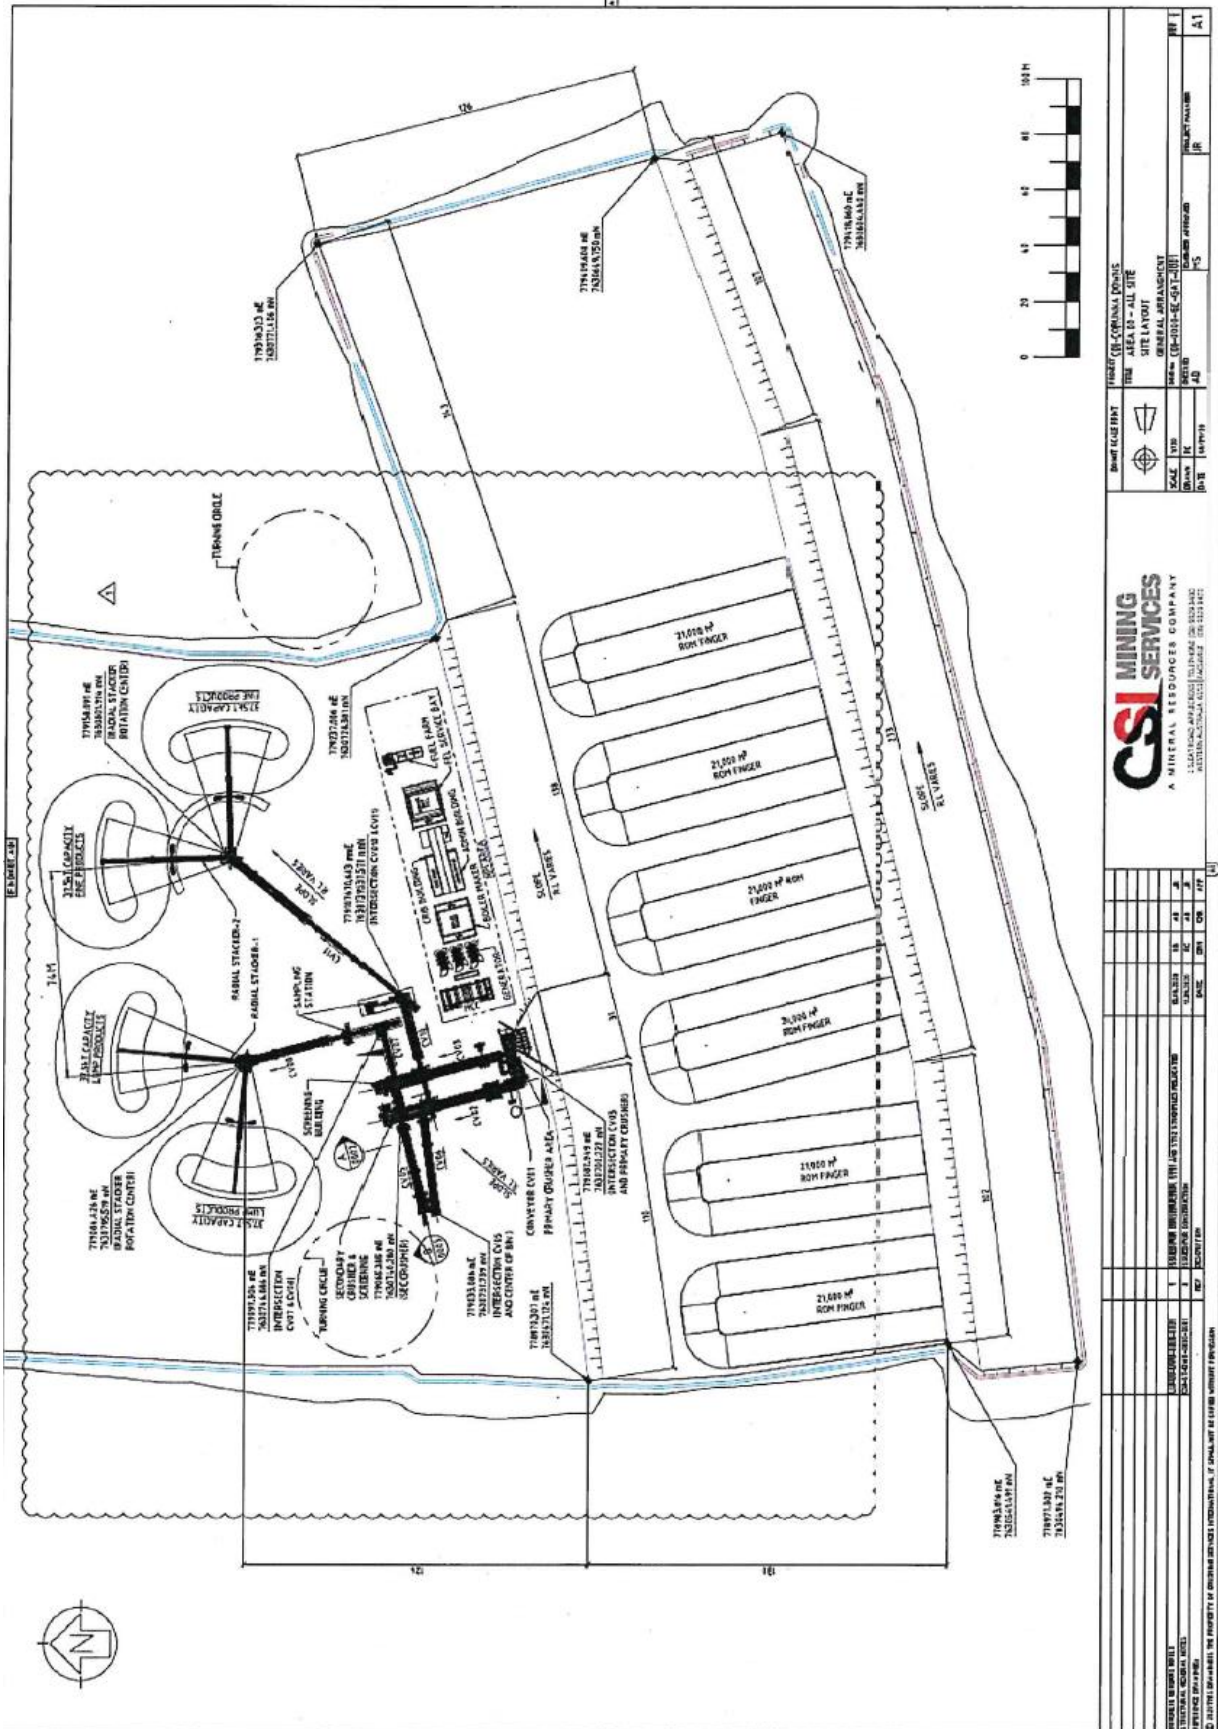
'As constructed' crushing and screening plant layout (Atlas, 2021b)
